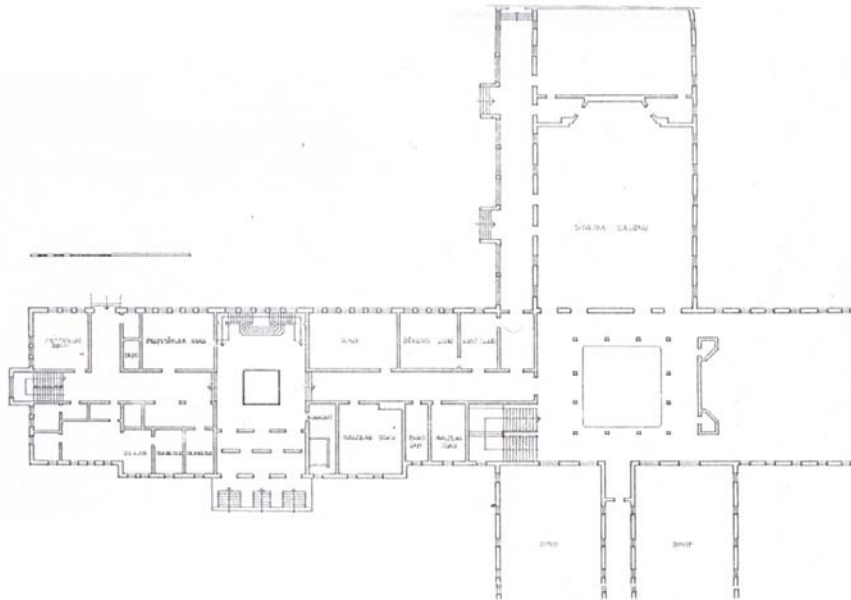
Plan of *Ankara University* Faculty of Law (ground and 1<sup>st</sup> Floor plan)
